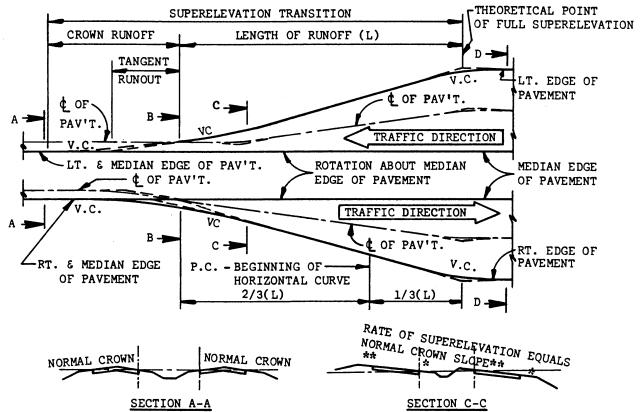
SUPERELEVATED SECTION-SINGLE OR DIVIDED HIGHWAY
